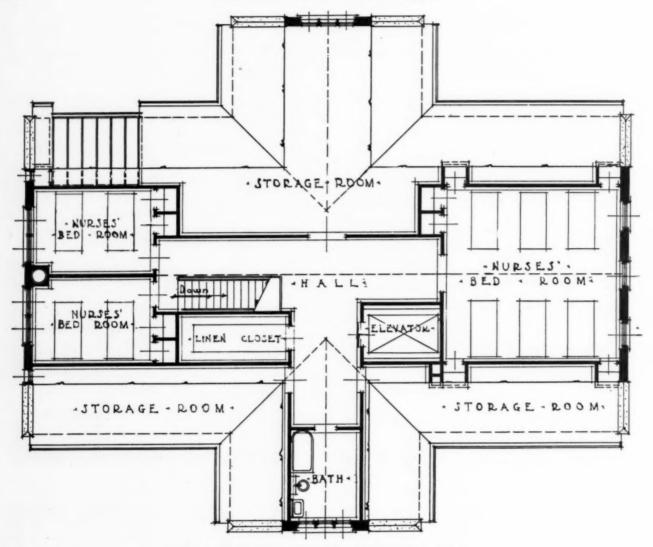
King's Daughters' Hospital-Third floor and roof plan.
